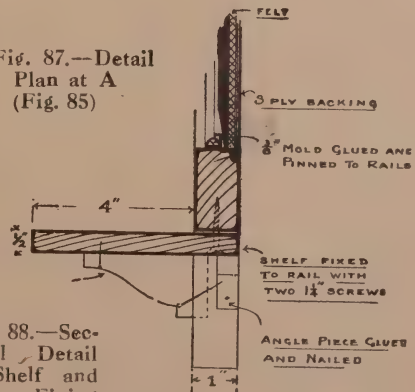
Sectional Detail of Shelf and Mirror Fixing
